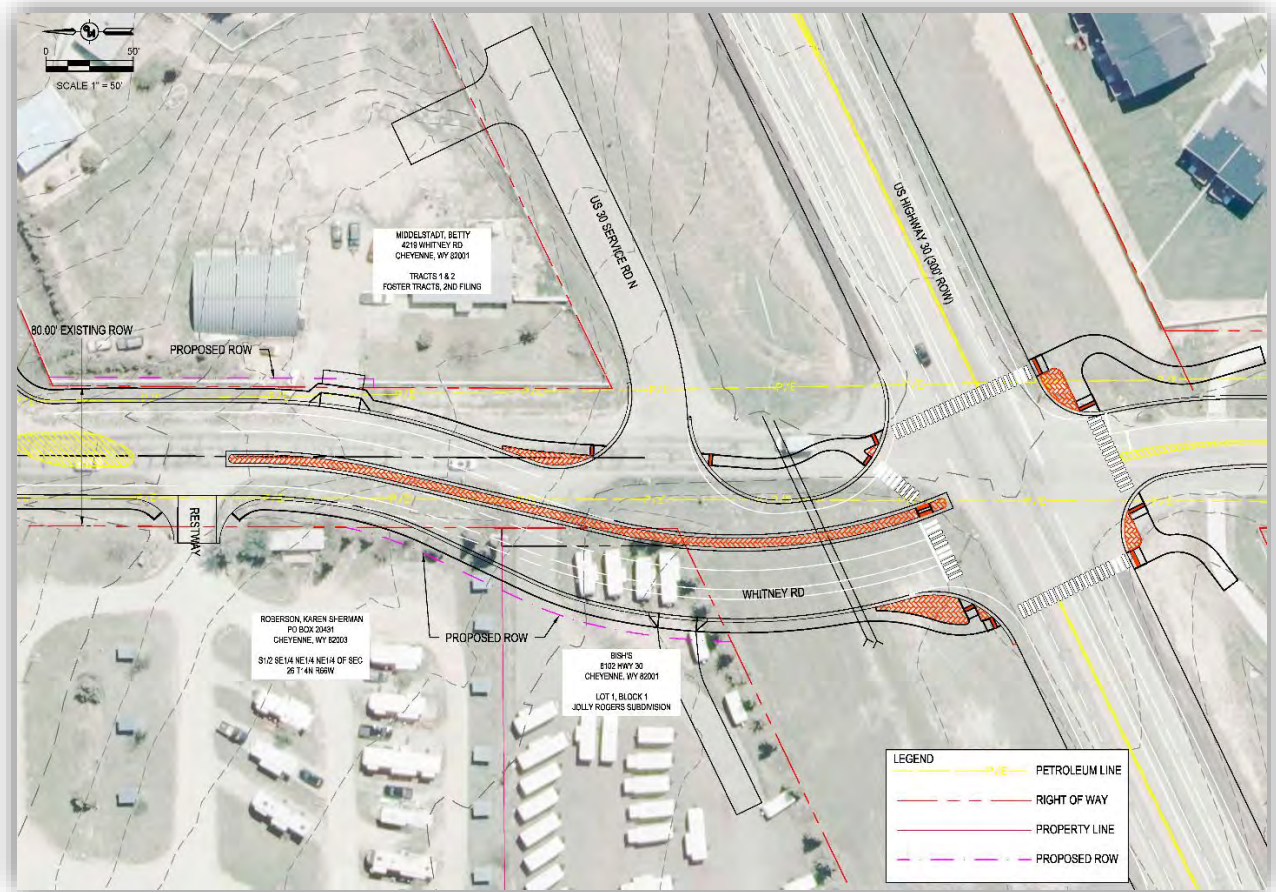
Recommended Intersection Alternative Whitney Road at U.S. 30
